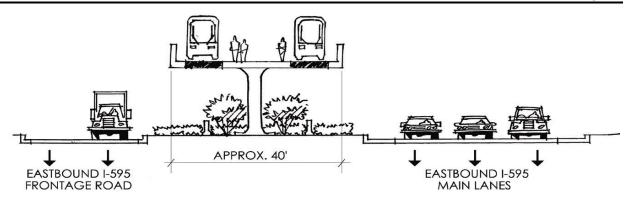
Exclusive Guideway, Type A – aerial structure with platform, freeway right-of-way
